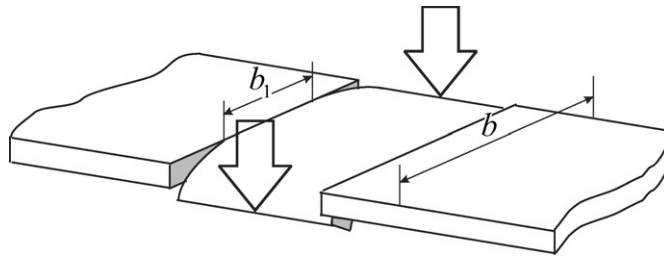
Initial phase of failure of the rear flange with the out-of-plane (Mode III) fracture.
